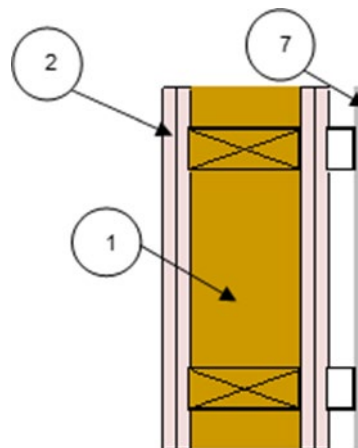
External timber framed wall with non-fire grade cladding – Section view
